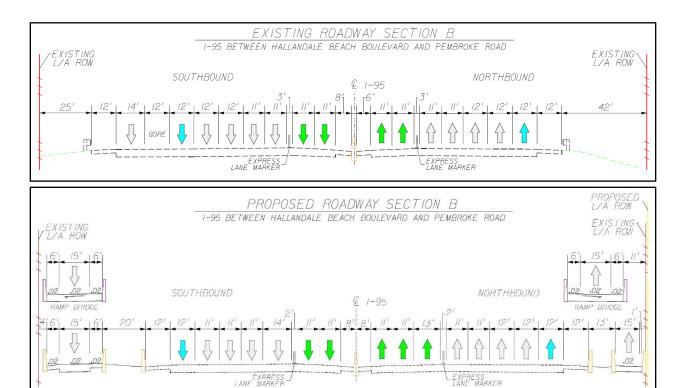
Existing Conditions and Preferred Alternative Roadway Section between Hallandale Beach Boulevard and Pembroke Road
